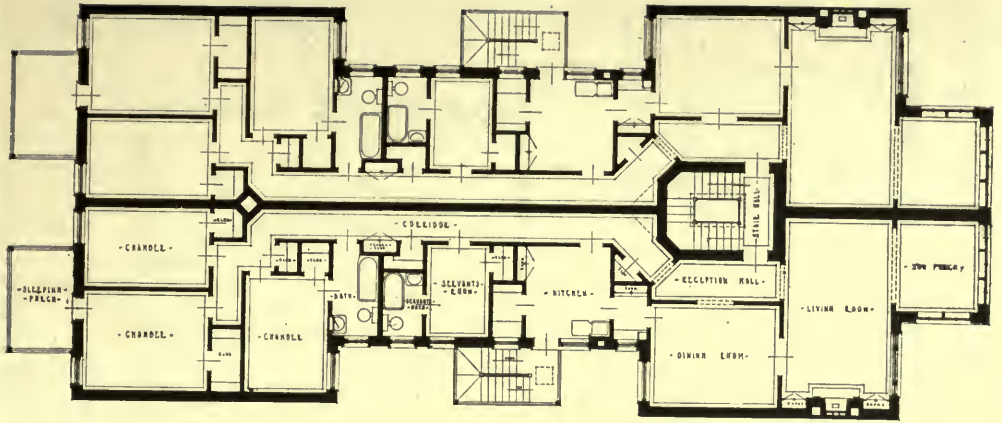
FLOOR PLANS OF APARTMENT BUILDING FOR MRS. EDGAR MARTIN, CHICAGO, ILL. EDGAR MARTIN, ARCHITECT.
